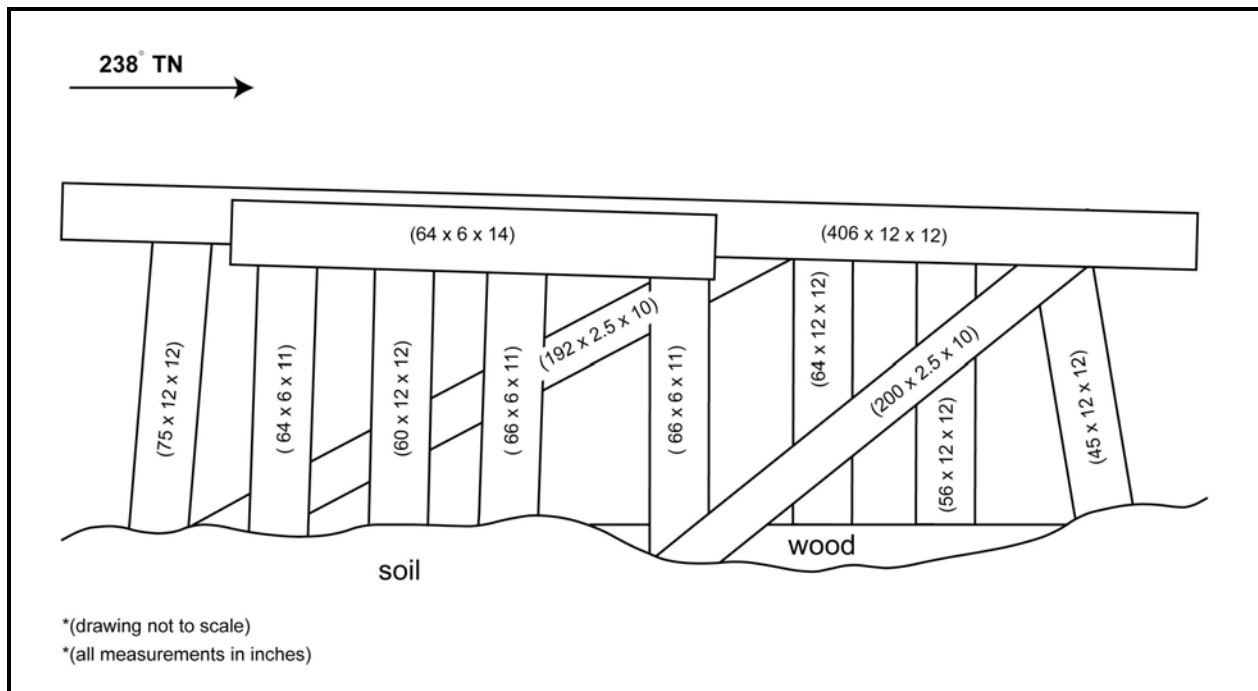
Schematic profile of SIHP # 50-80-07-6822 (a.k.a. Bridge 3), showing wooden bridge columns and bents with dimensions, plank X-bracing is not depicted but plank dimensions are shown
